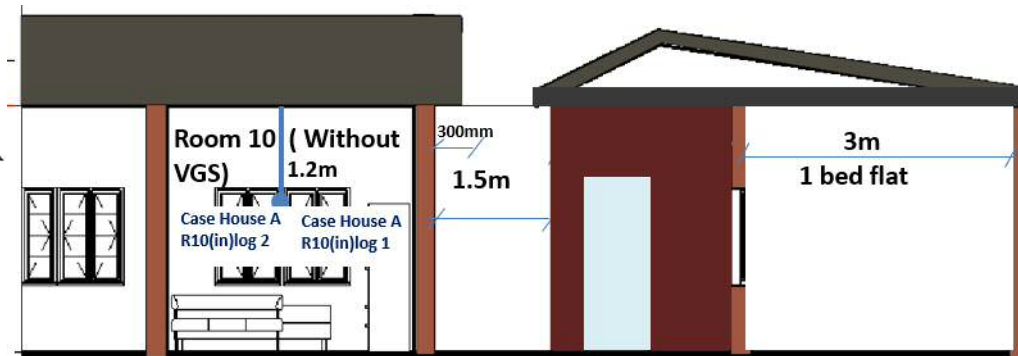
; Cross-section of Rooms 1 and 10 showing location of data loggers in Case House A, source: Author, 2014
